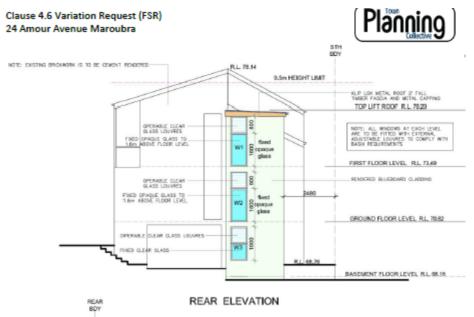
Extract of proposed lift elevation plan as viewed at the rear.
